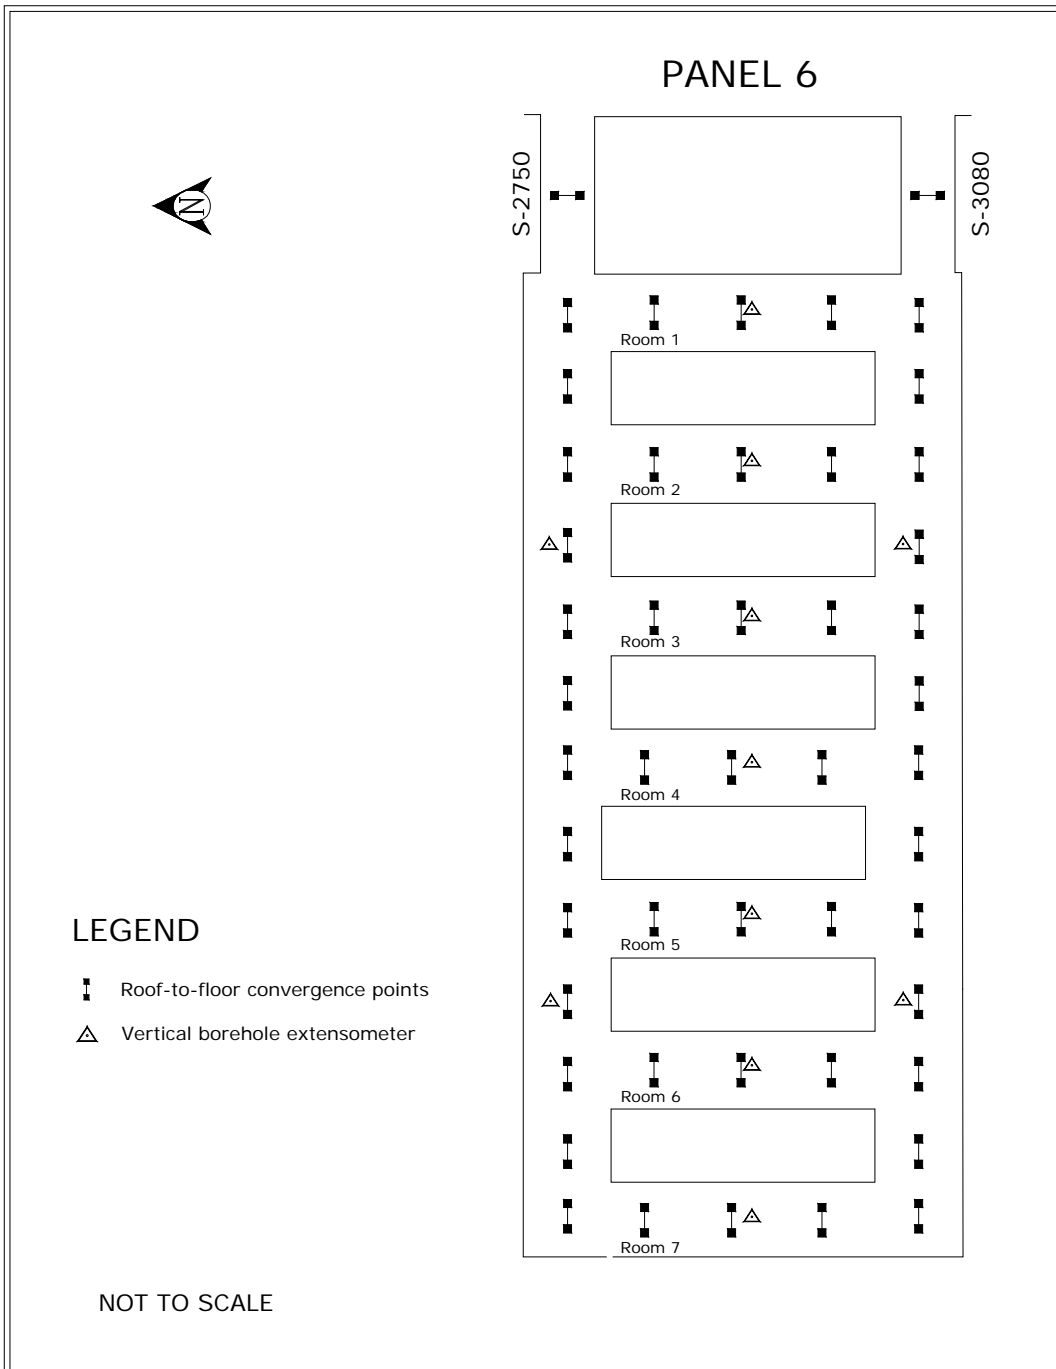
4 – Location of Panel 6 Geotechnical Instruments
